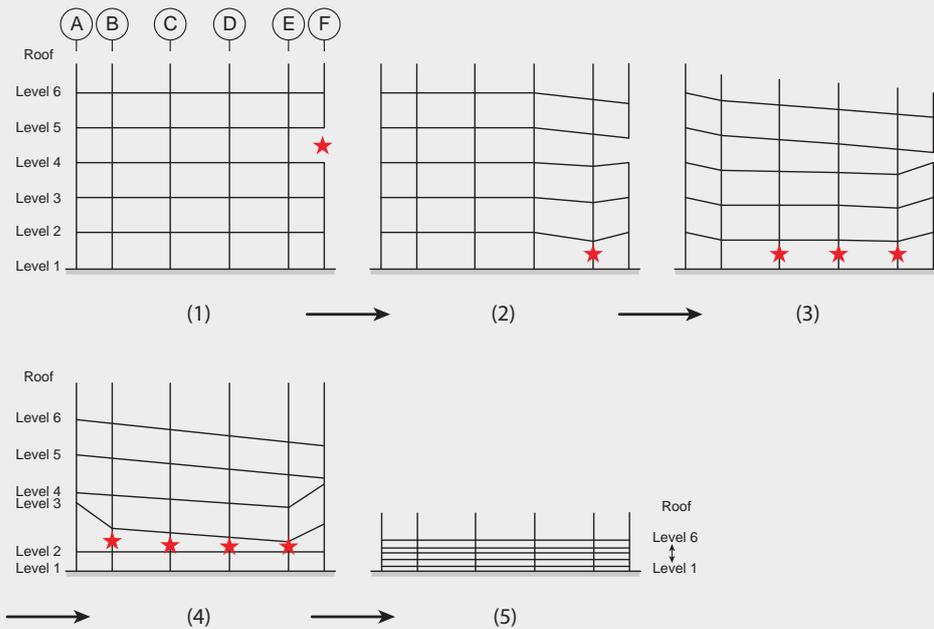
Possible progression of collapse from loss of column capacity on Line F is shown sequentially as follows: (1) Collapse of Line F columns above Level 4 leads to extra floor area being supported of columns on Line E; (2) The Line E columns begin to collapse under the extra load; (3) As the Line E columns sink additional floor area becomes supported on the Line D columns which in turn begin to collapse, causing an eastward tilt in the upper levels; (4) The upper levels then hit the Level 4 Line F; (5) The collapse completes with all floors laying on top of each other. Note that collapse is also spreading in the north-south direction simultaneously to this as shown in Figure 19.
